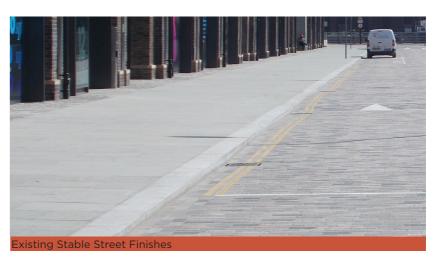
Existing Lewis Cubitt Square and Stable Street
